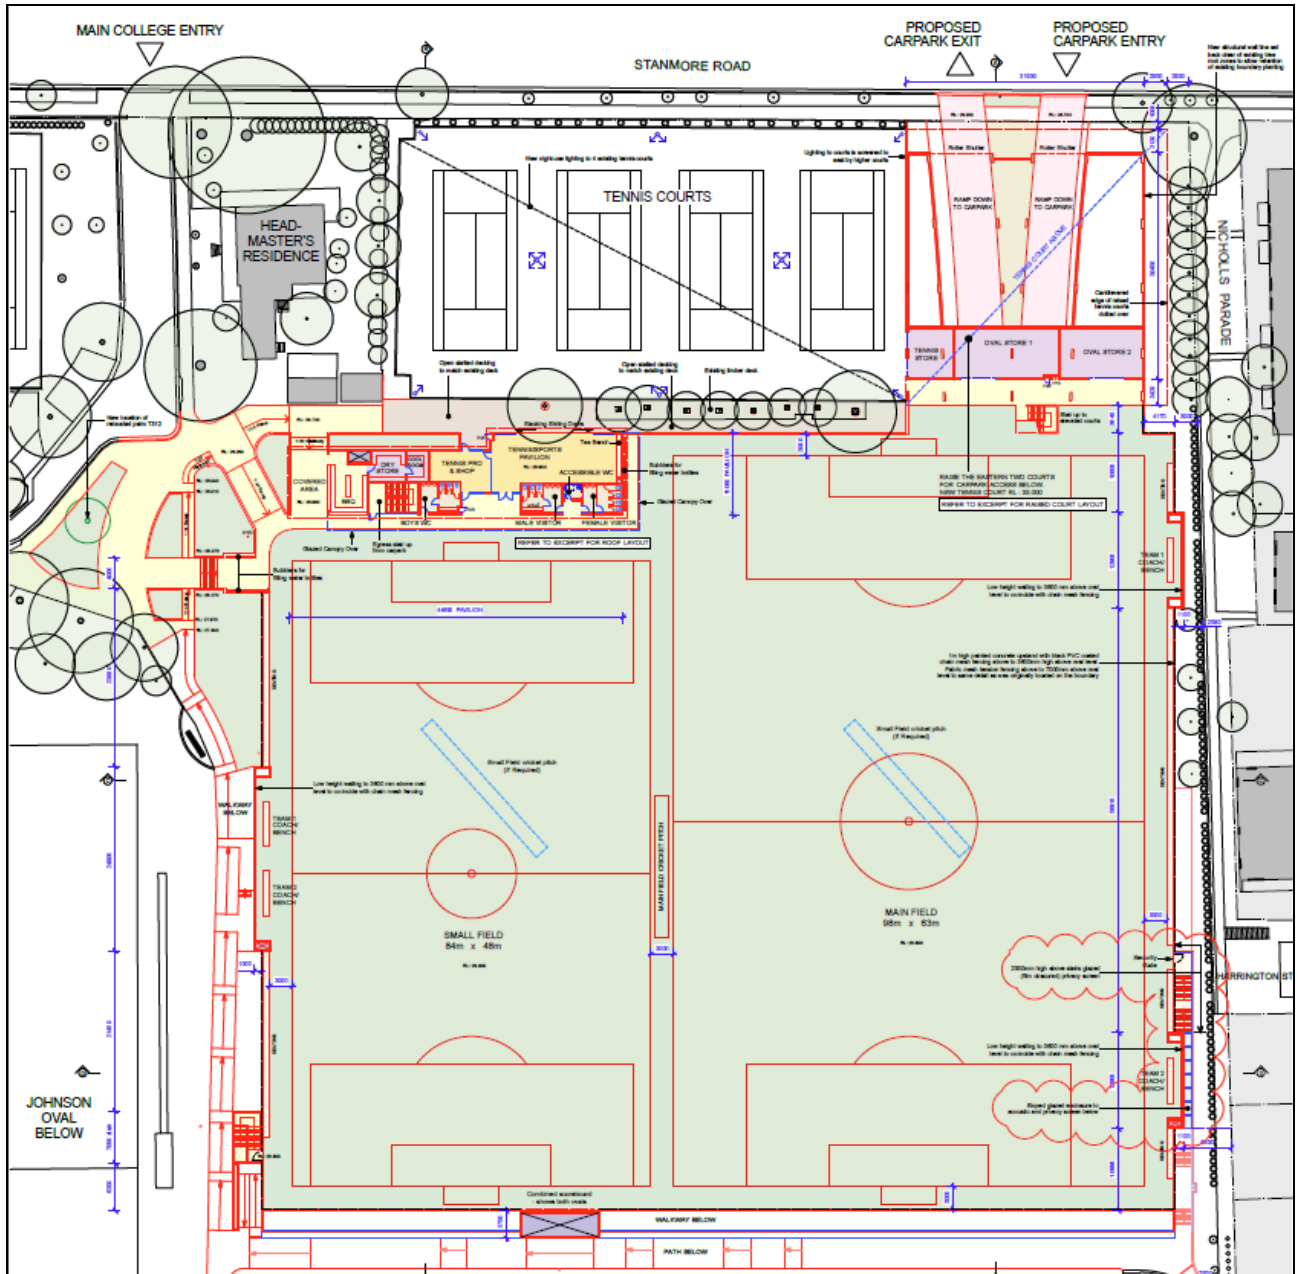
Carpark and first floor of proposed Old Boy's Sporting Complex
